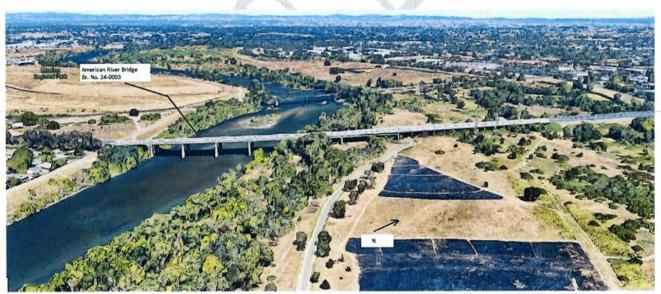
Aerial view of the American River Bridge, Br. No. 24-0003
